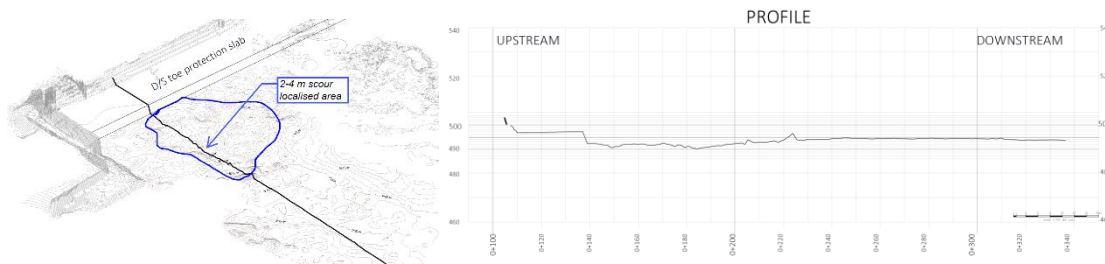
GERD, Plan and profile of the 2024 bathymetric survey at the downstream dam toe
